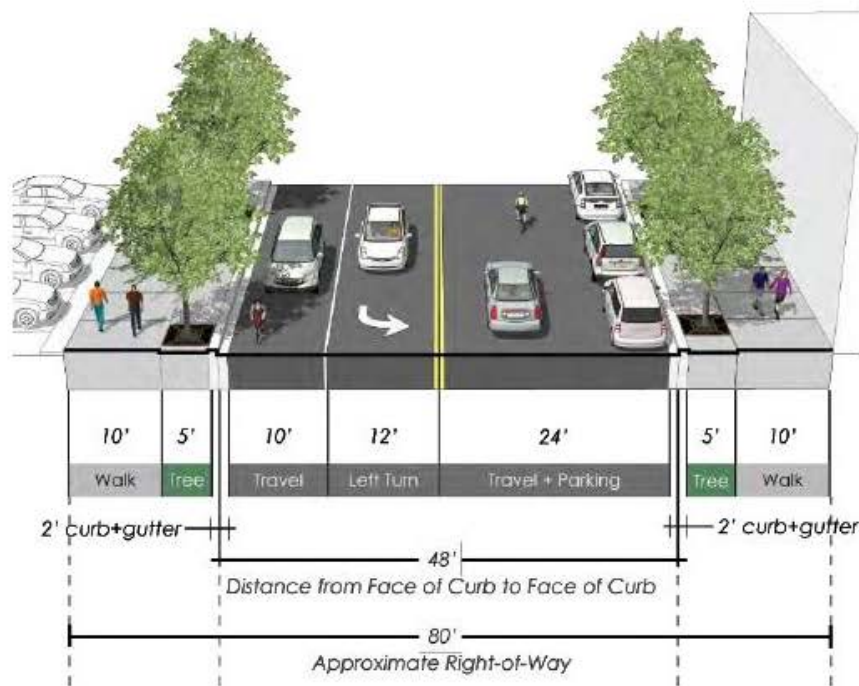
Existing Section – Cheltenham Drive from Wisconsin Avenue to Alley (Facing East)
